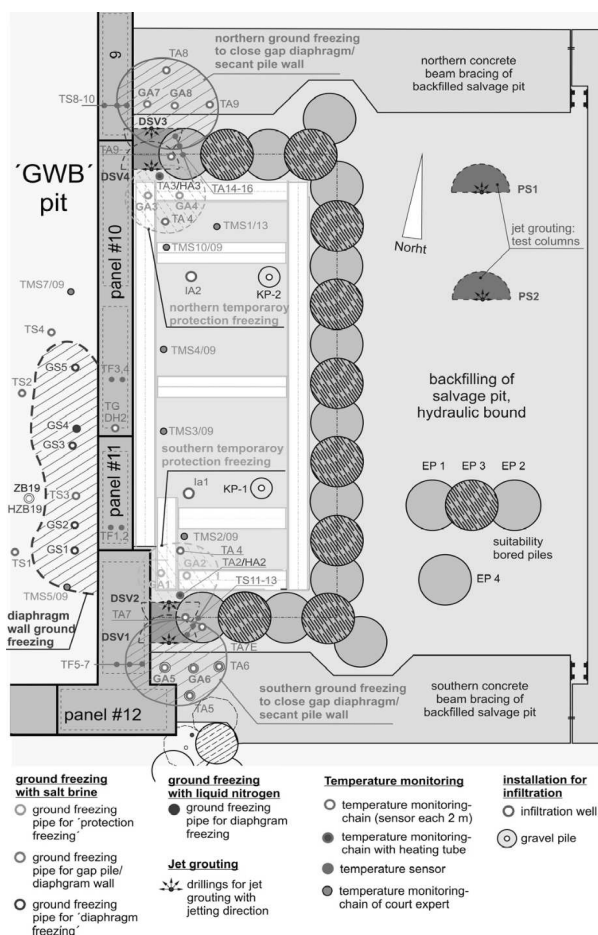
Ground plan of the investigation pit with secant bored pile wall and connecting construction to the diaphragm wall of the 'GWB' pit plus ground freezing for the diaphragm wall.
